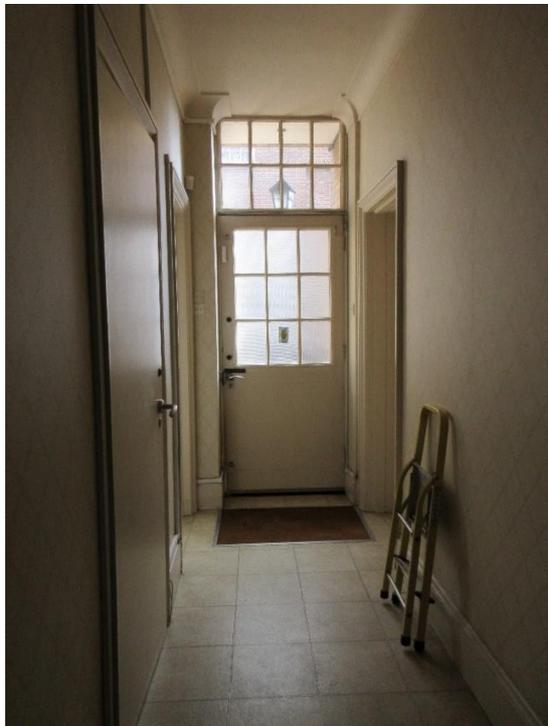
(left): Side (south-east) entrance/exit, viewed from corridor.
